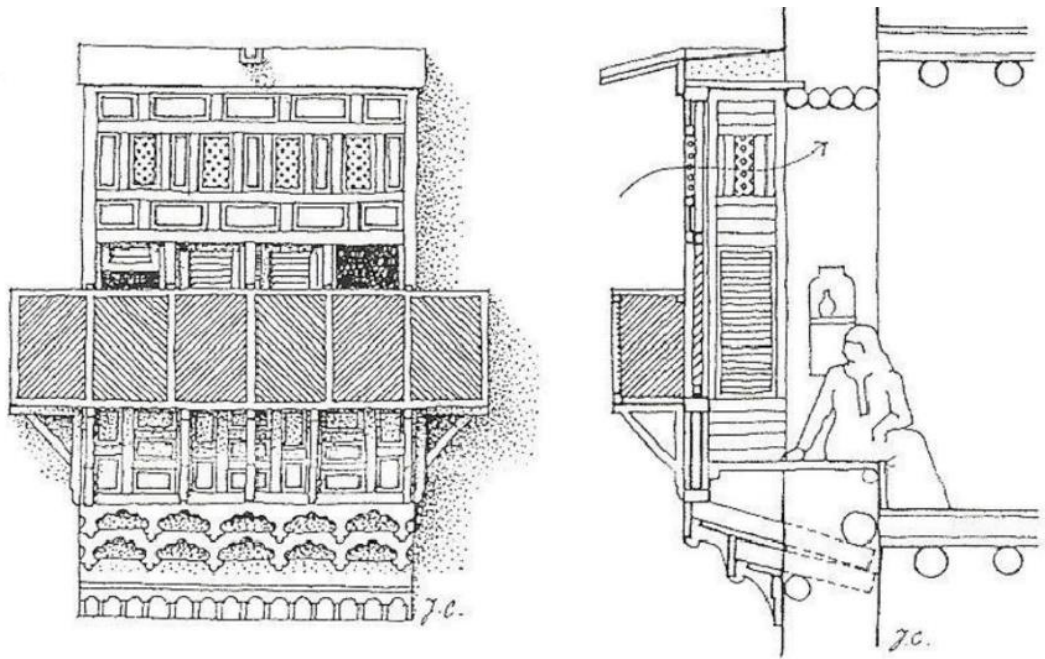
Details of Mashrabiyyah in Elevation and Section View ⁶⁷.
